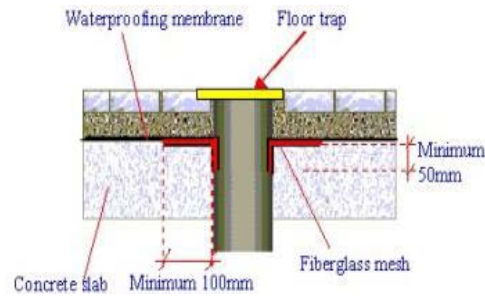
Detailed construction drawing for floor trap waterproofing (Chew, 2010)
